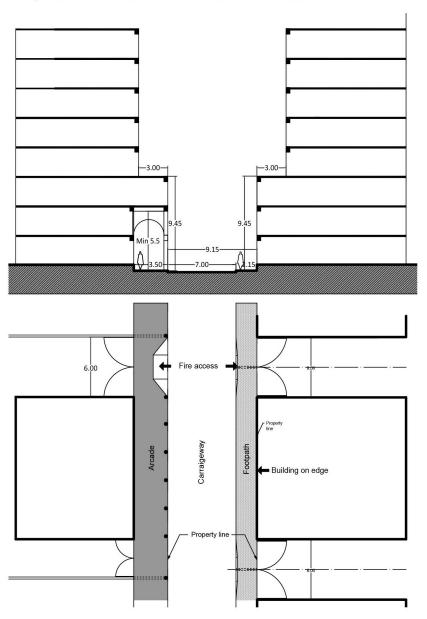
Section and Plan for street with ROW 9.15 M (i)
